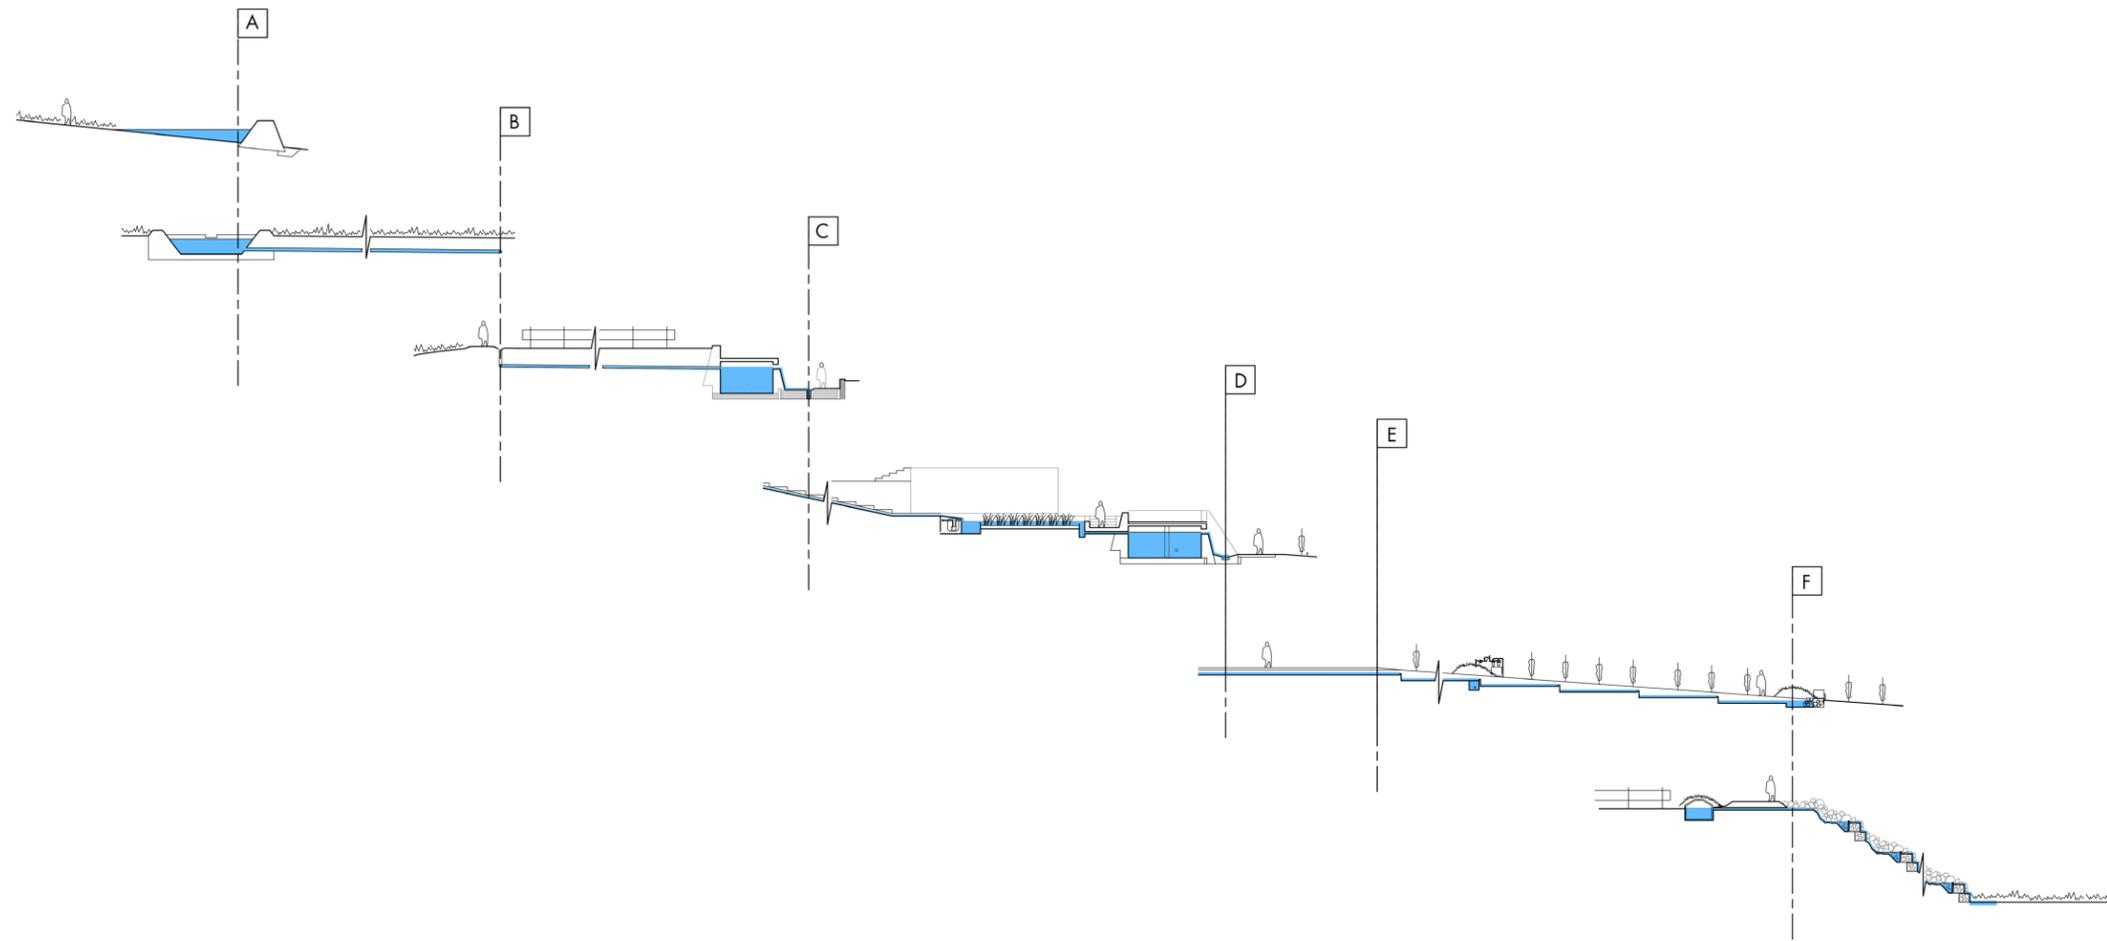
1:400 WATERCOURSE SECTION DETAILS
